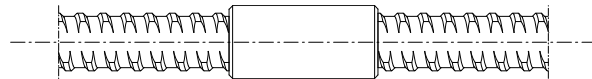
End bearing splice – Contact coupler and two thread bars – Schematic examples
